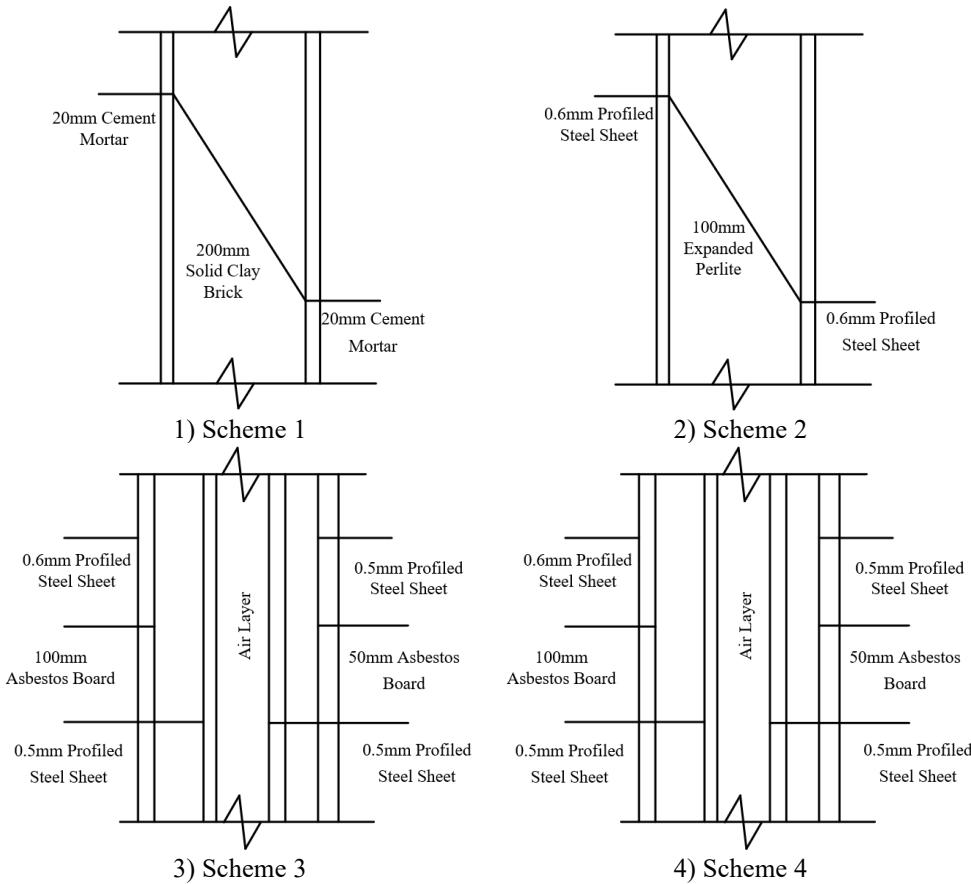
Four optimized design schemes for building exterior wall insulation layers
